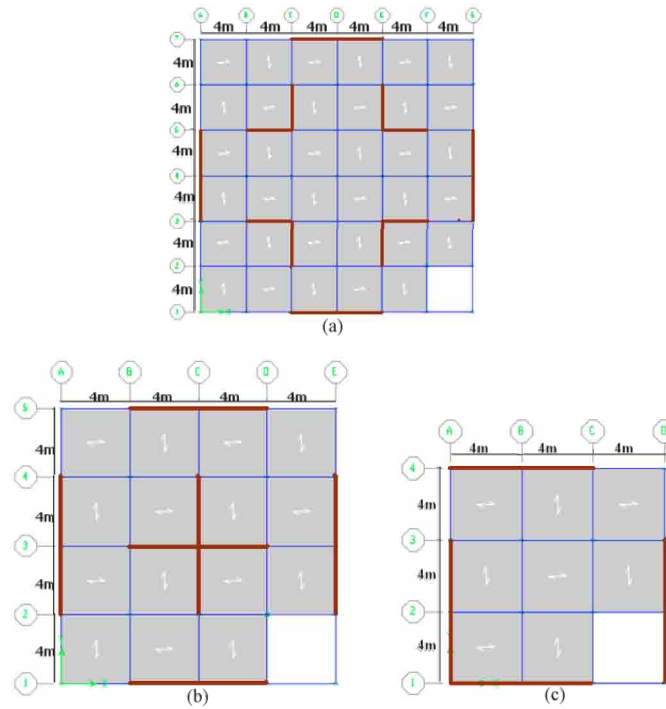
Plans of studied buildings, a 5-story, b 10-story and c 15-story (thick line: bracing)
